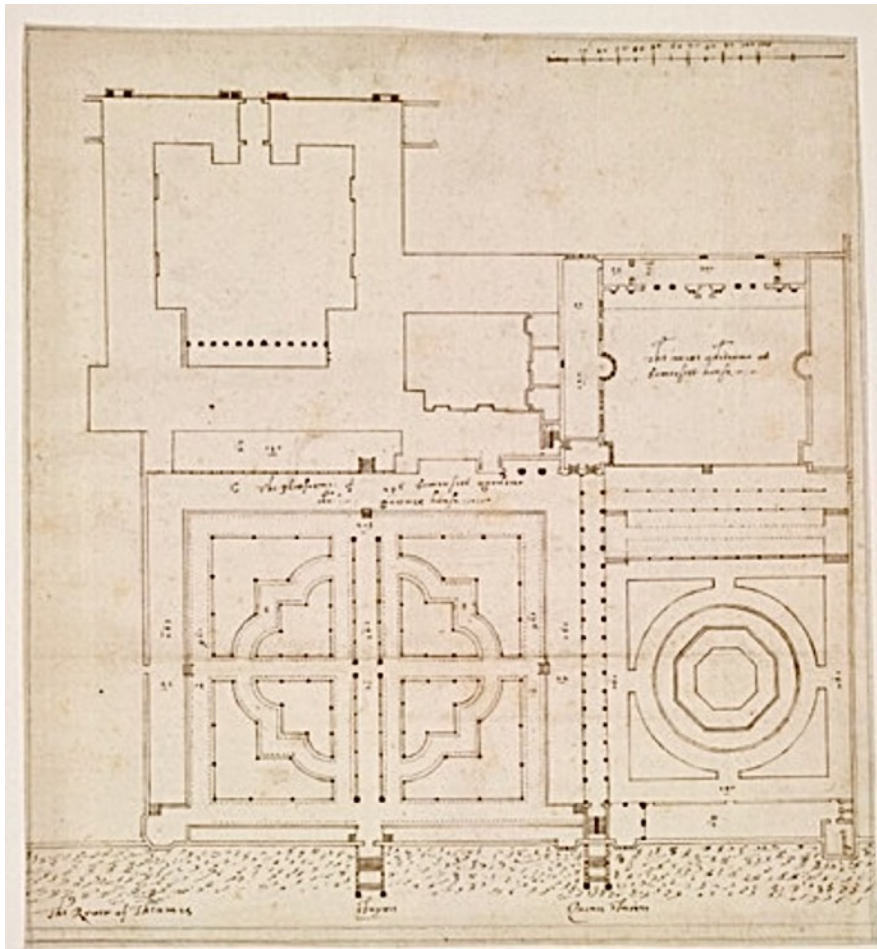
Somerset House, London, Smythson’s plan of the gardens, RIBA archives SC229/I/13. By permission RIBA.
